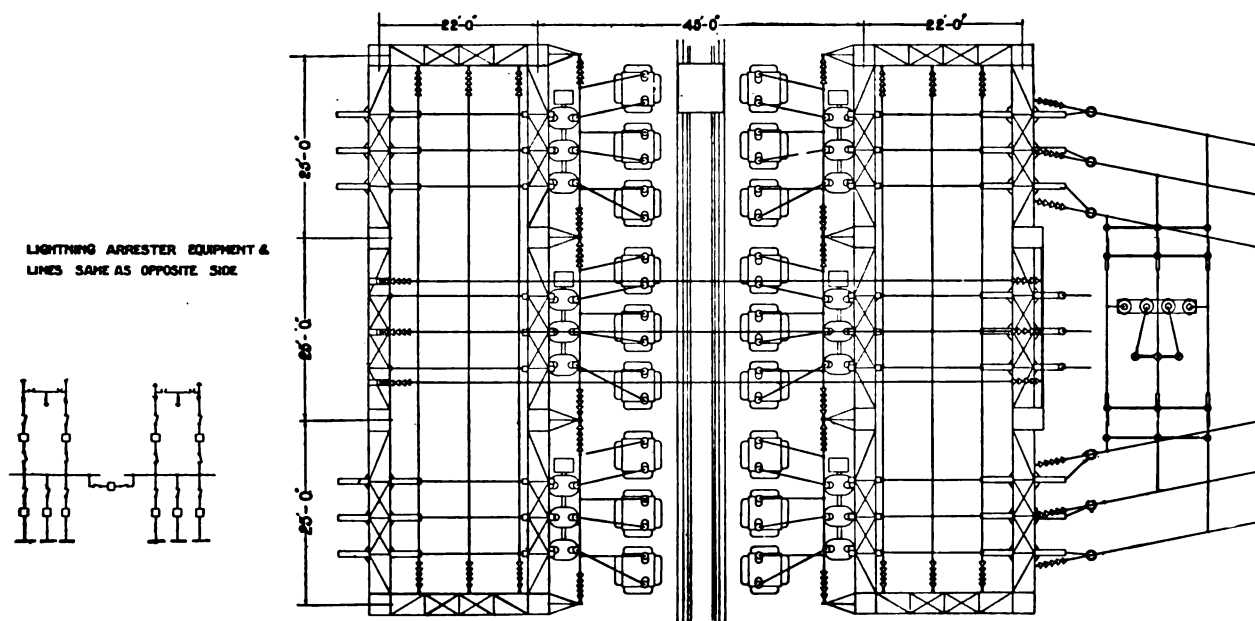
Layout of 88-kV outdoor station. Plan.
